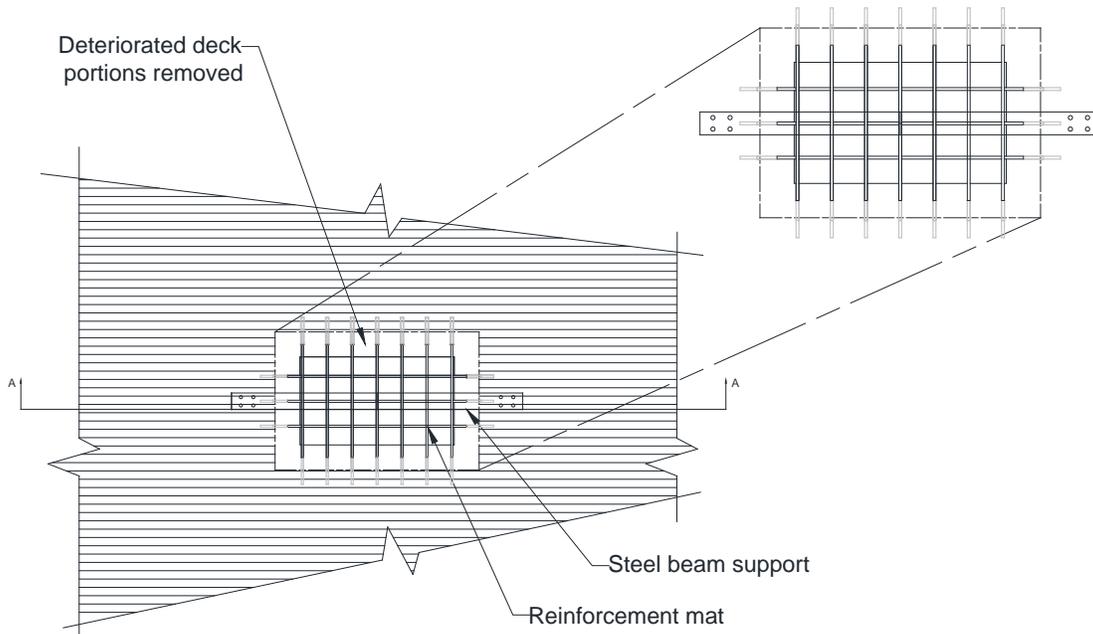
Full-depth laminated deck repair of larger area – plan view
